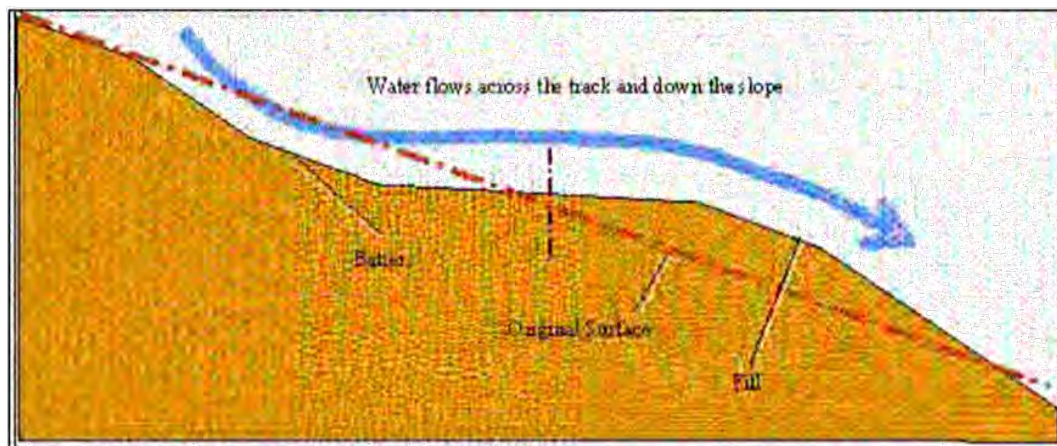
Access Track Infrastructure – Out *Slope* Formation Details
